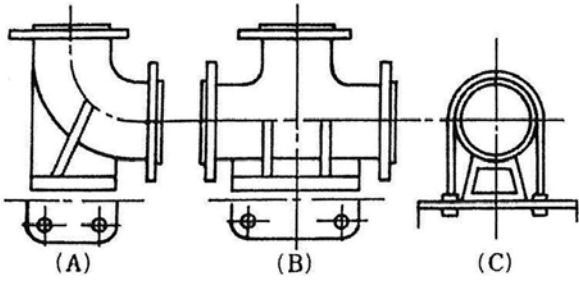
Fixed anchor (fixed support platform)¹⁰
